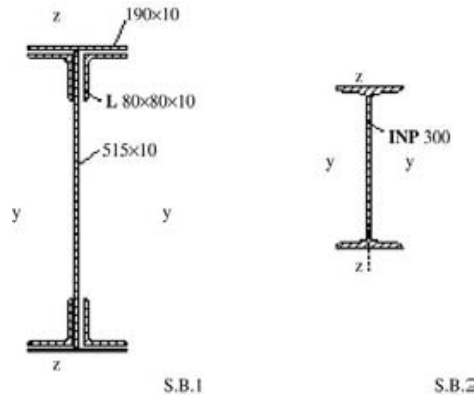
Cross sections of secondary beams (S.B. 1 and S.B. 2).
